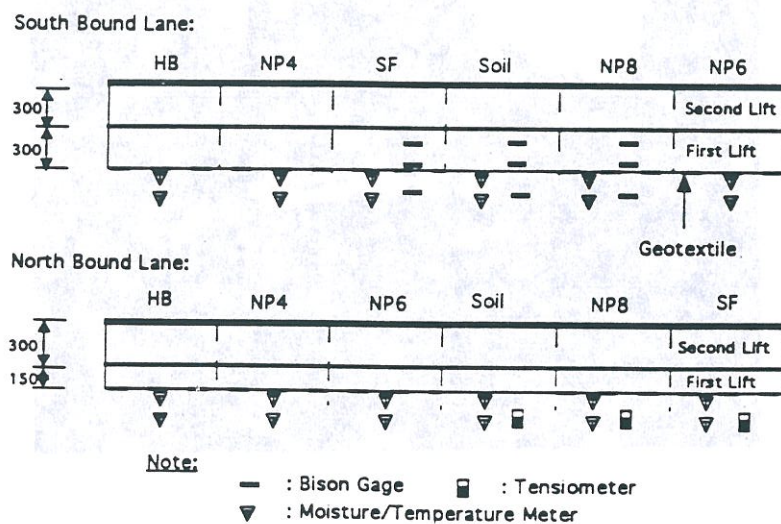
Cross Section Showing Instrumentation Placement (dimensions in mm).
